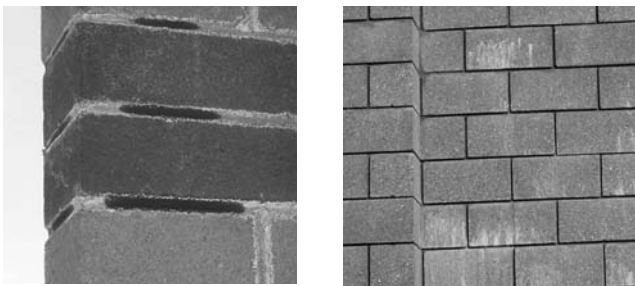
(left): Photograph of a newly constructed masonry wall. Note damp mortar beds and the efflorescence occurring primarily on the mortar joints
